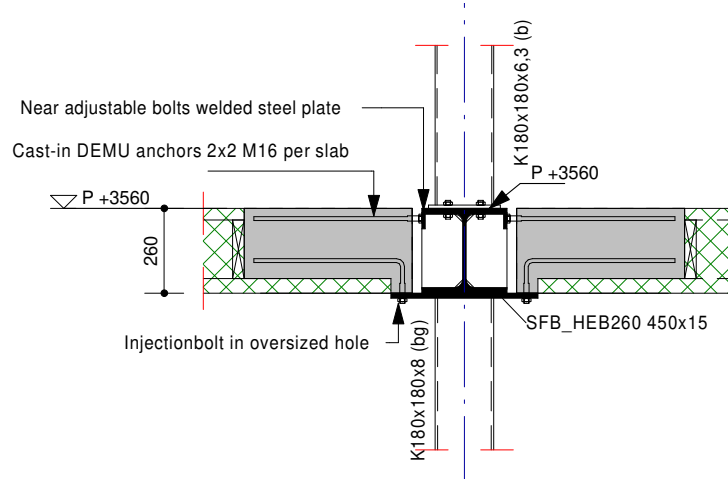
Connection detail between hollow core slabs, SFB and columns
